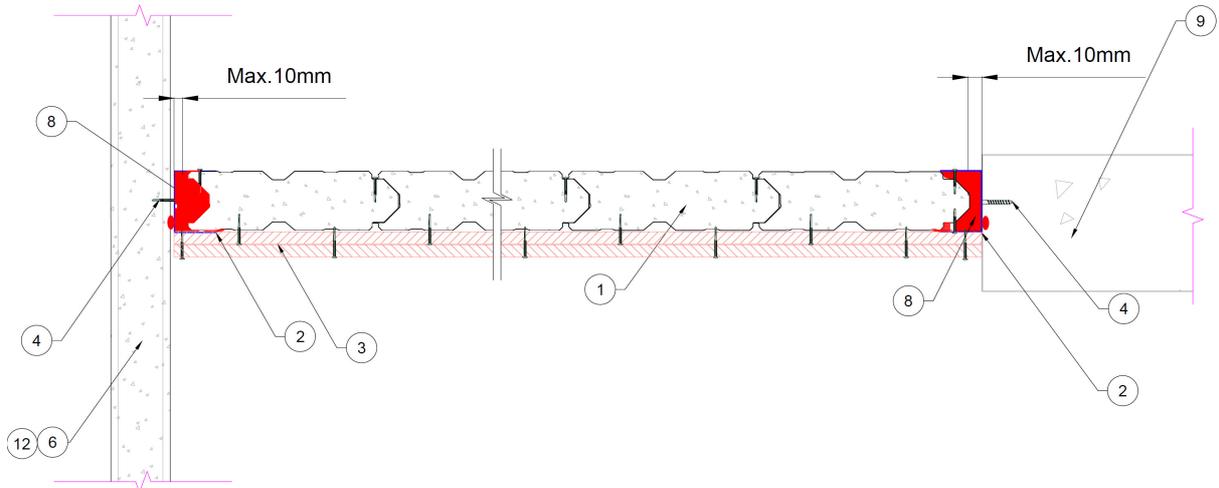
Speedpanel ceiling protected with plasterboard linings (Cross Section View)
